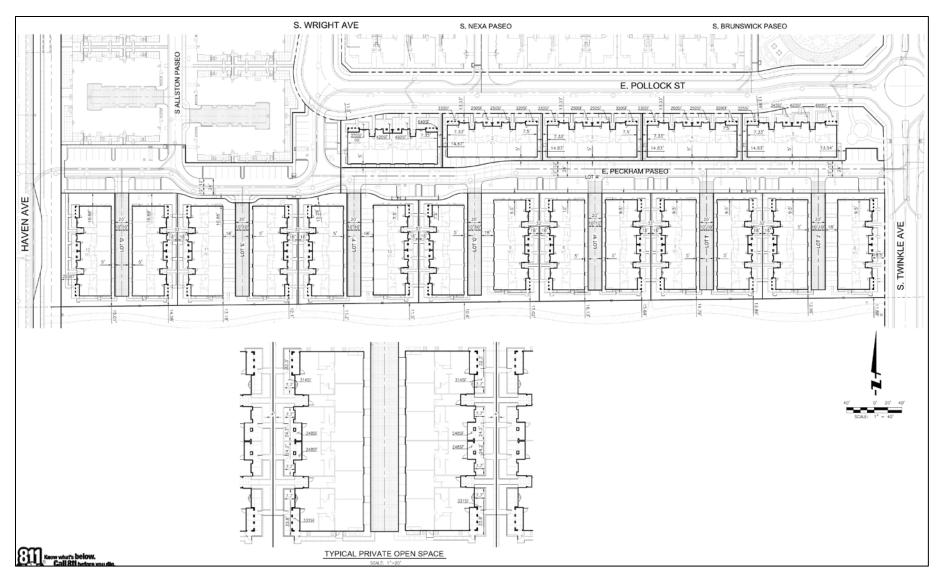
6-PLEX ROW TOWNHOMES TYPICAL PLOTTING
